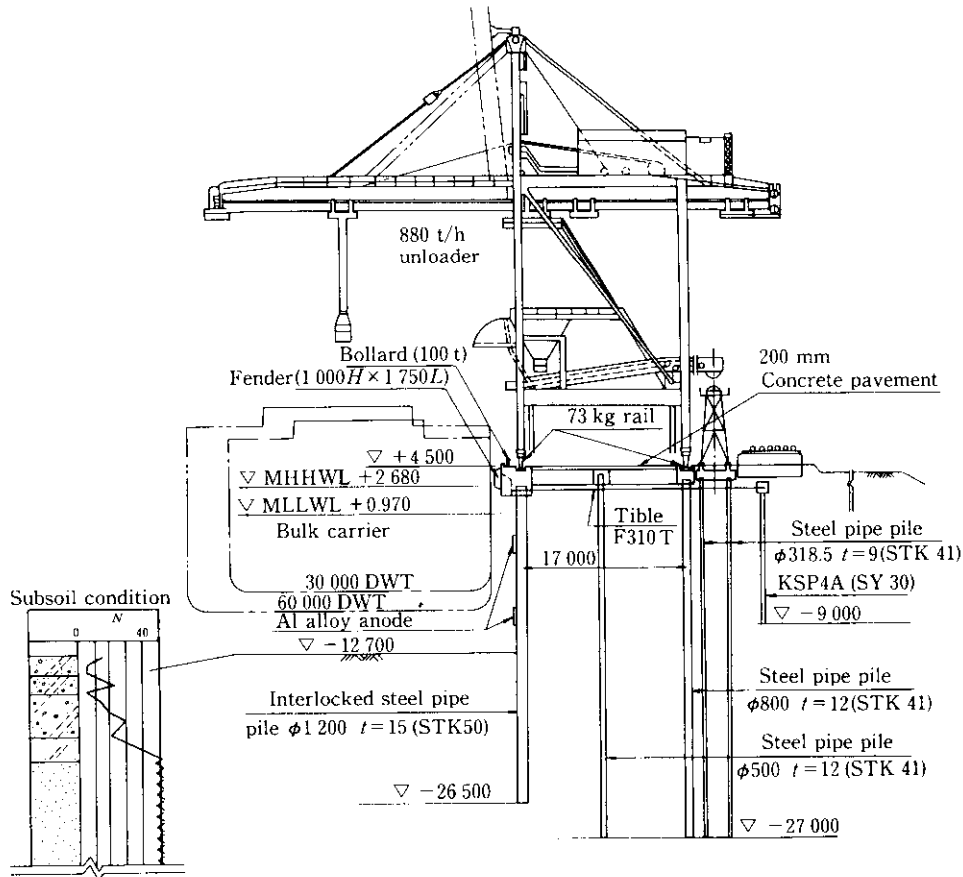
Typical cross section of wharf structure supported on interlocked steel pipe piles
